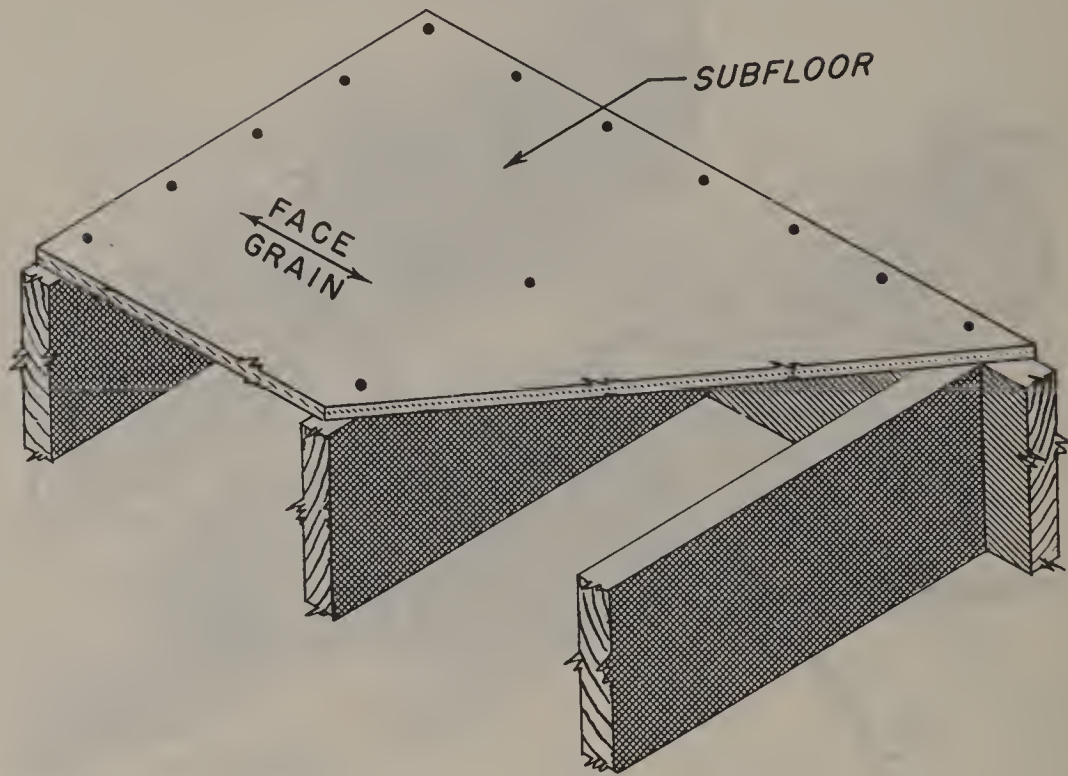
Subfloor. Plywood nailed with eightpenny nails spaced 5 inches along all edges and 10 inches along intermediate members. Note: Plywood subfloor is preferably placed with grain of face plies at right angles to joist.
